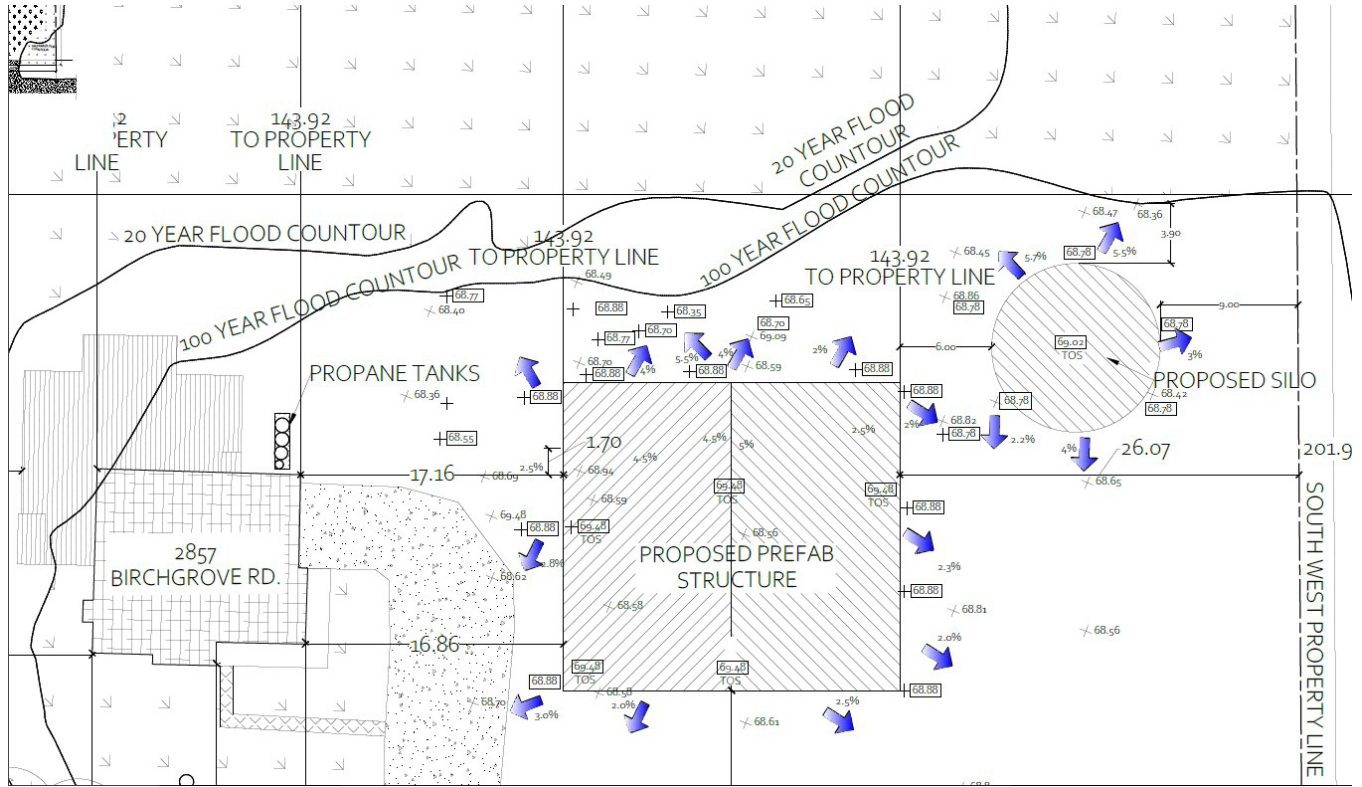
Grading plan of the subject property showing the proposed structures and the 100-year flood contour.
